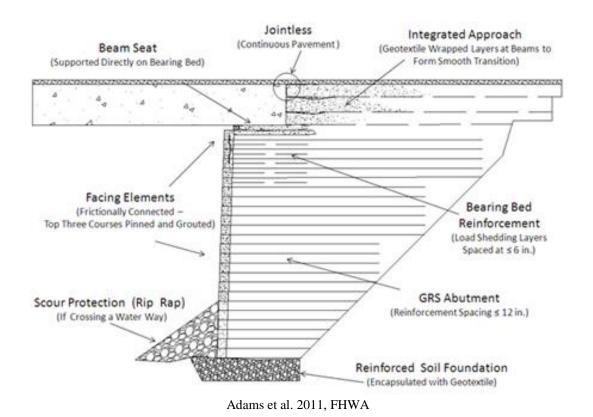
Elevation view of geosynthetic-reinforced soil abutment
